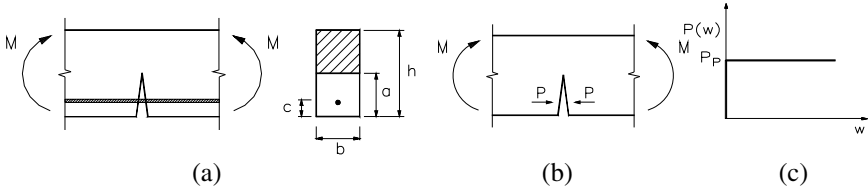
(a) Cracked beam with a brittle matrix and a single layer of reinforcement loaded in flexure, (b) Bridged-crack modeling of problem (a) and (c) Bridging traction law (adapted from [12]).
